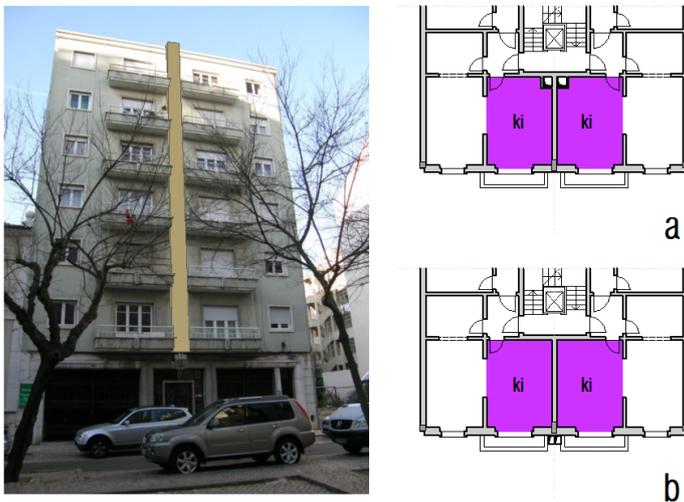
Simulation of the two hypothesis for constructing a kitchen in the front façade: a) introducing a new duct; photo and b) attaching plumbing casing to the façade. (photo: SE 2010)
